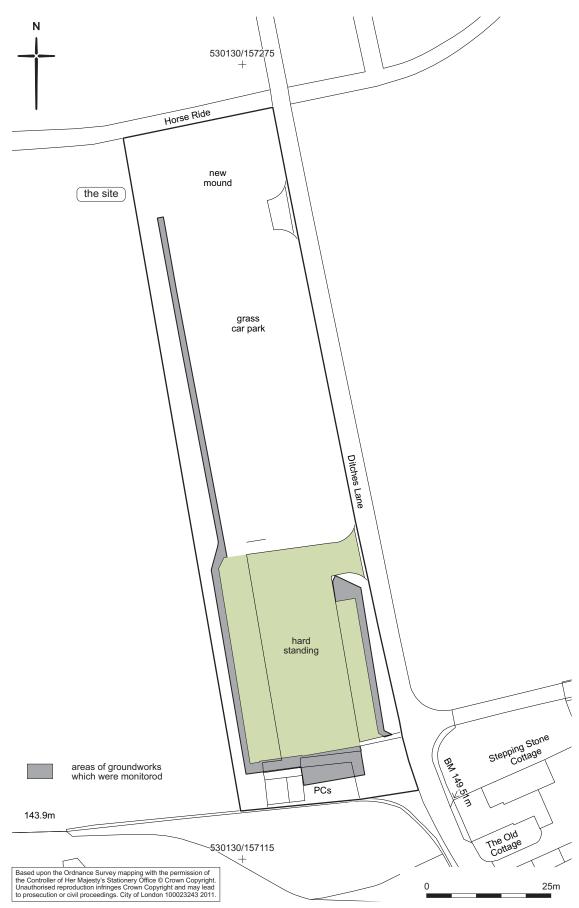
Plan of proposed works at Ditches Lane car park, showing the extent of groundworks which were monitored
